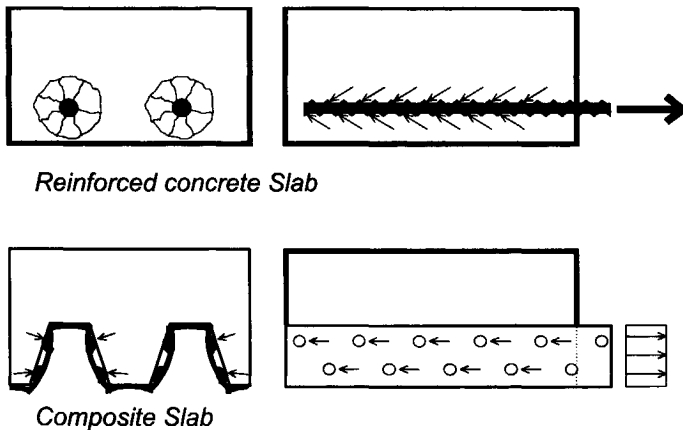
Analogy between reinforced concrete and composite slabs.
